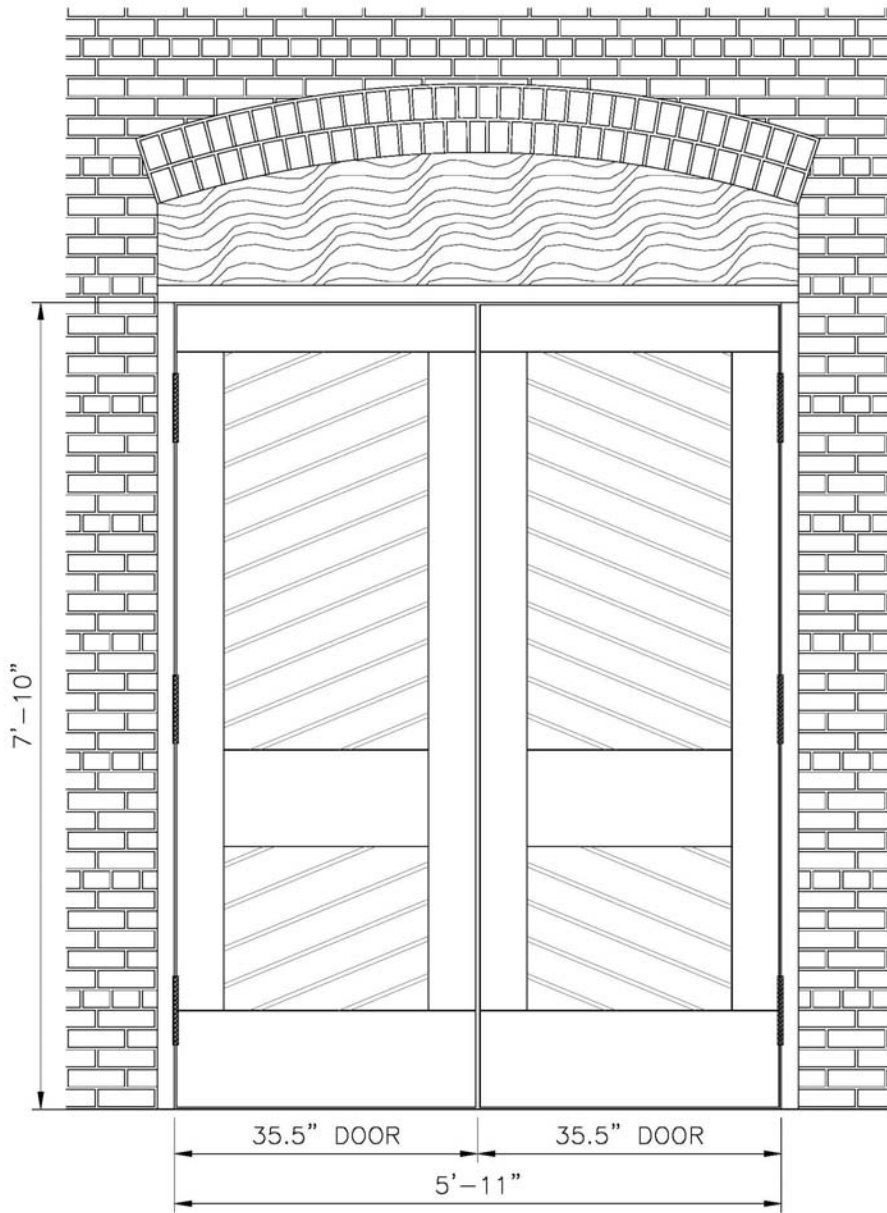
Elevation of Existing Door at the 1882-1883 Building
